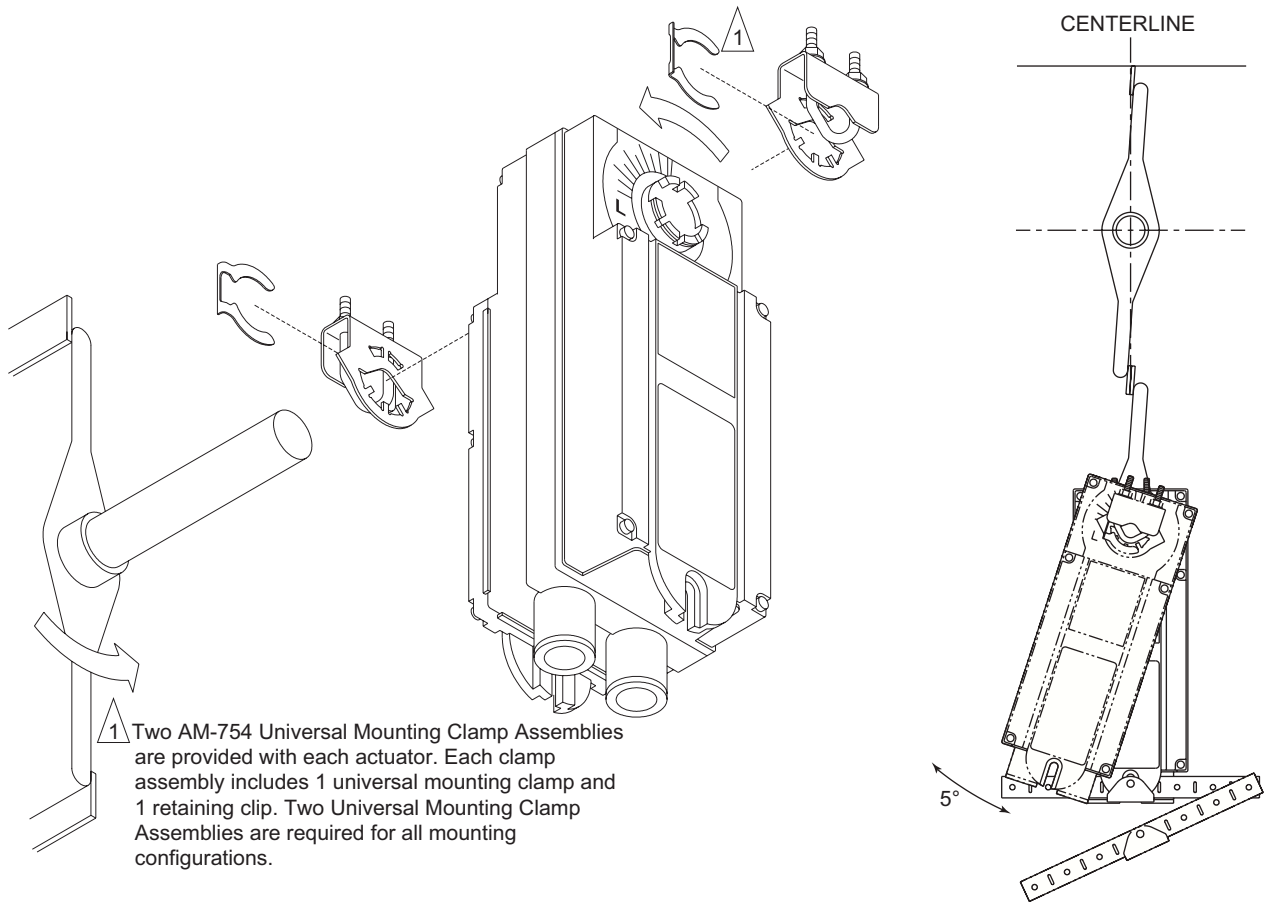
Long Damper Shaft Mounting and Actuator Parts Identification, Actuator Rotation Counterclockwise to Closed.
